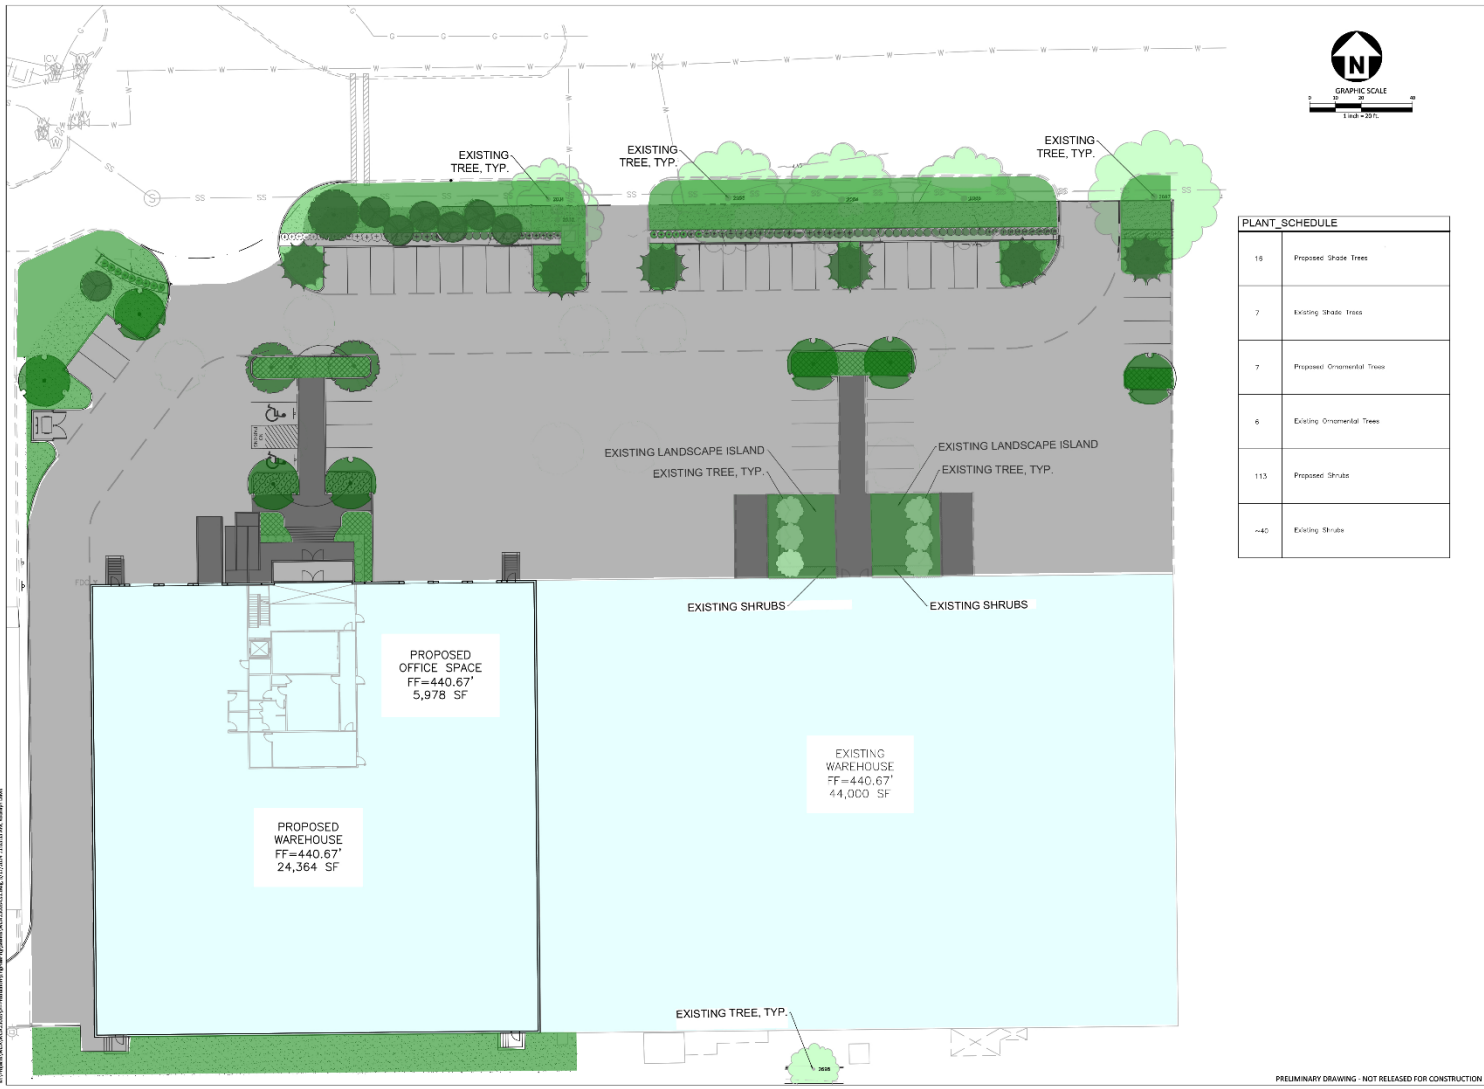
EXHIBIT D CONCEPTUAL LANDSCAPE PLAN
